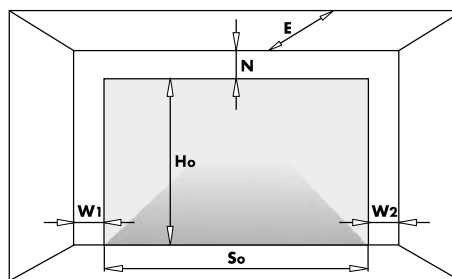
The assembly dimensions and designations thereof required for correct selection and assembly of WIŚNIEWSKI sectional industrial doors.
